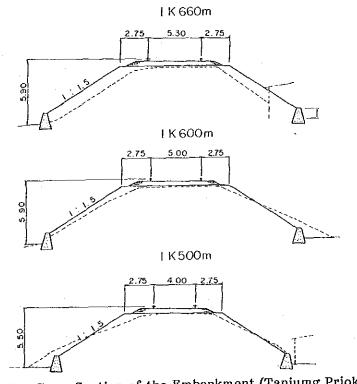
Cross Section of the Embankment (Tanjumg Prick Line)
